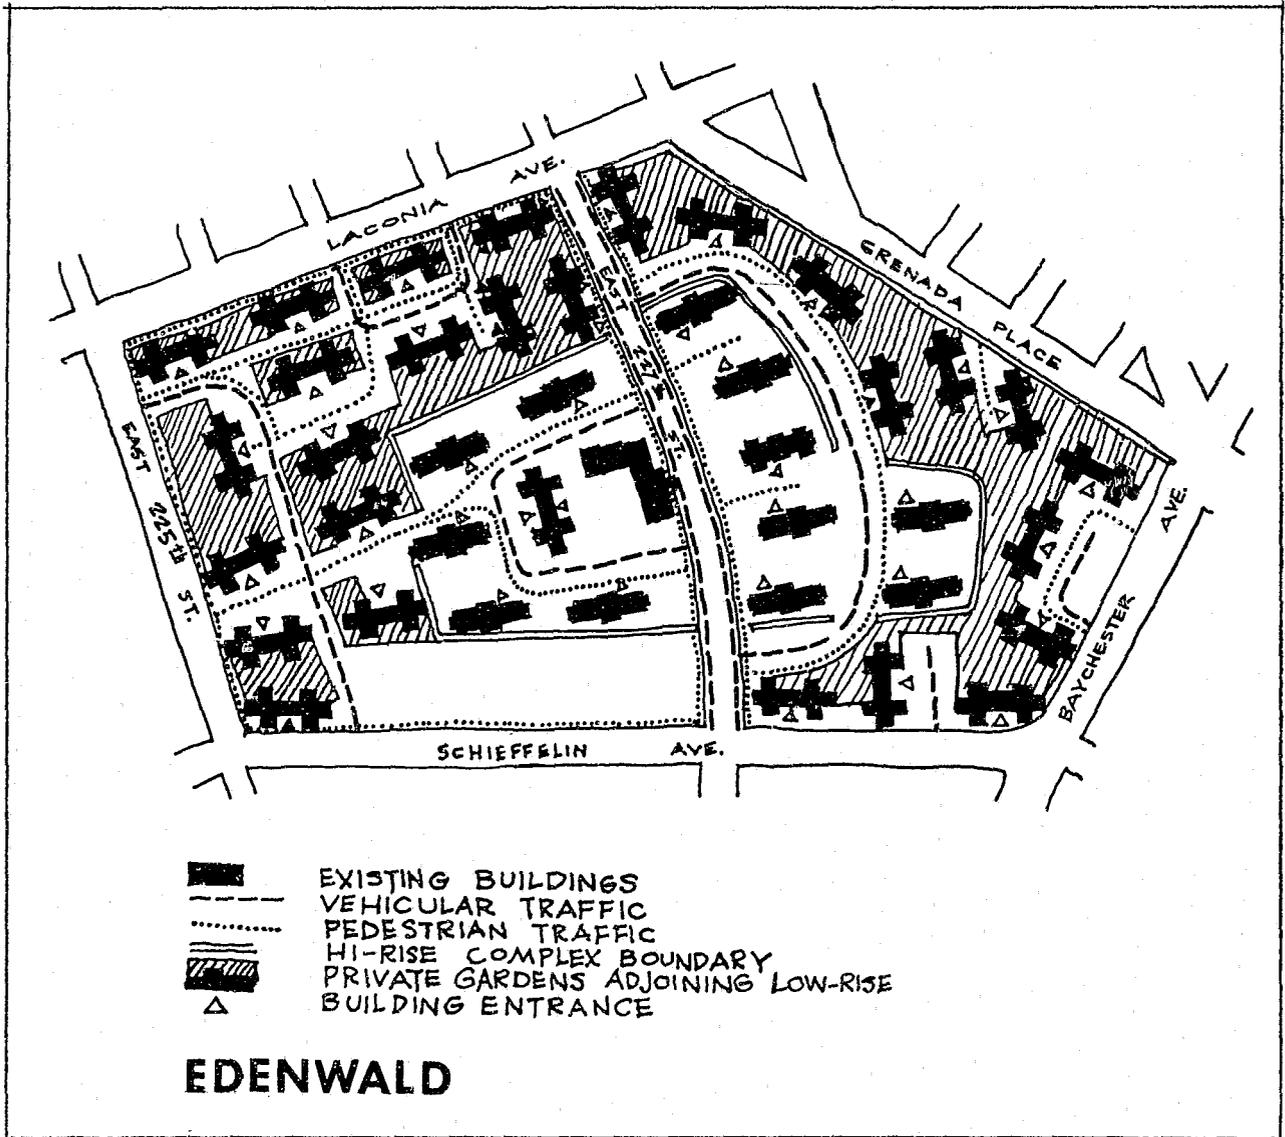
Sketch showing recommended improvements in Edenwald Houses site plan.
